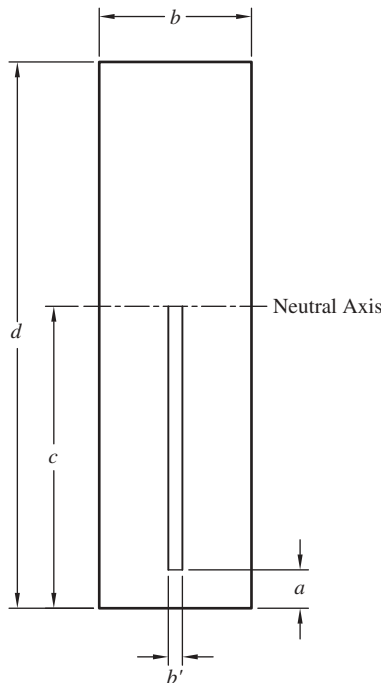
Section loss due to radial reinforcement.
